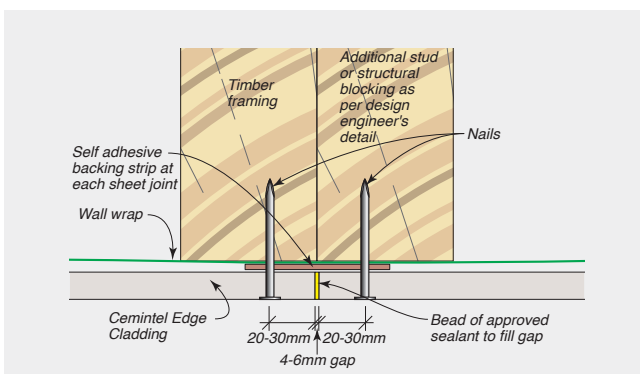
Typical Direct Fix V Groove Cladding Timber – Horizontal Joint
